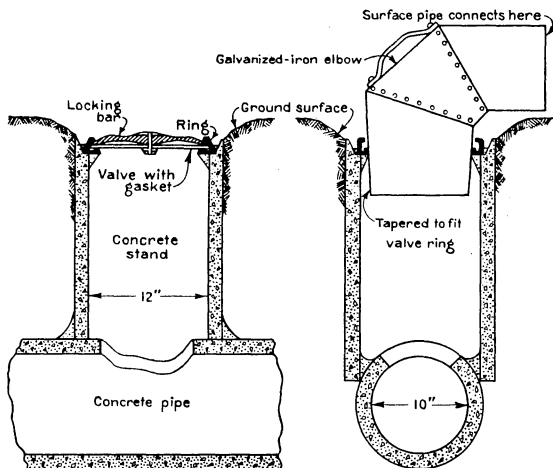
Riser showing valve or elbow connection for surface or pipe delivery.
